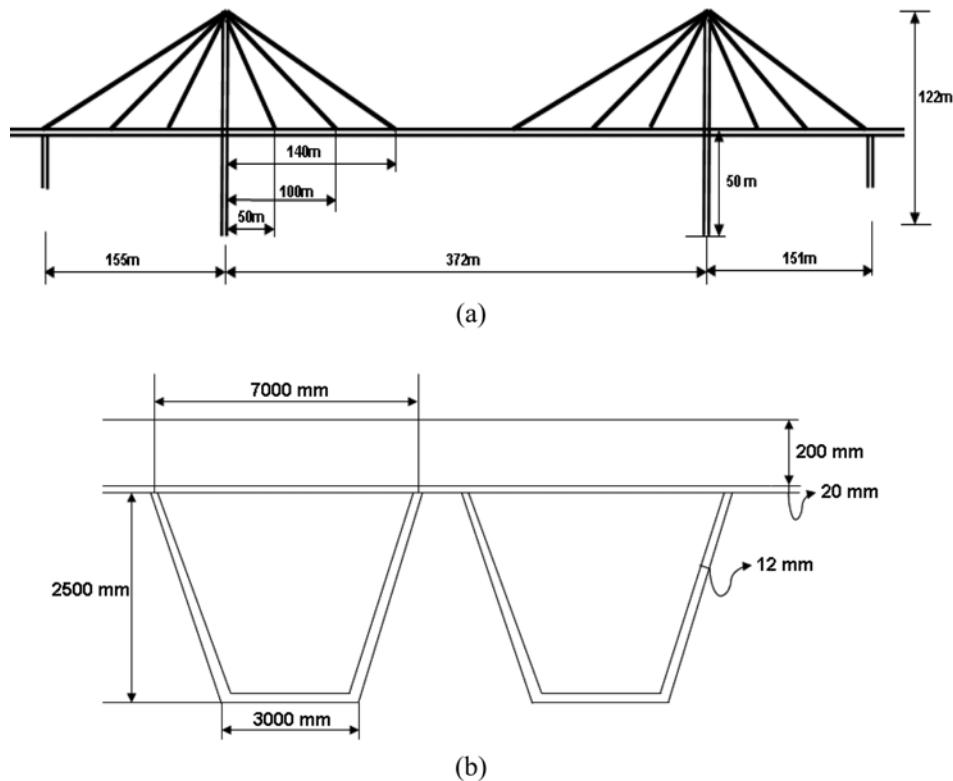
Luling Bridge (a) configuration and (b) cross section
